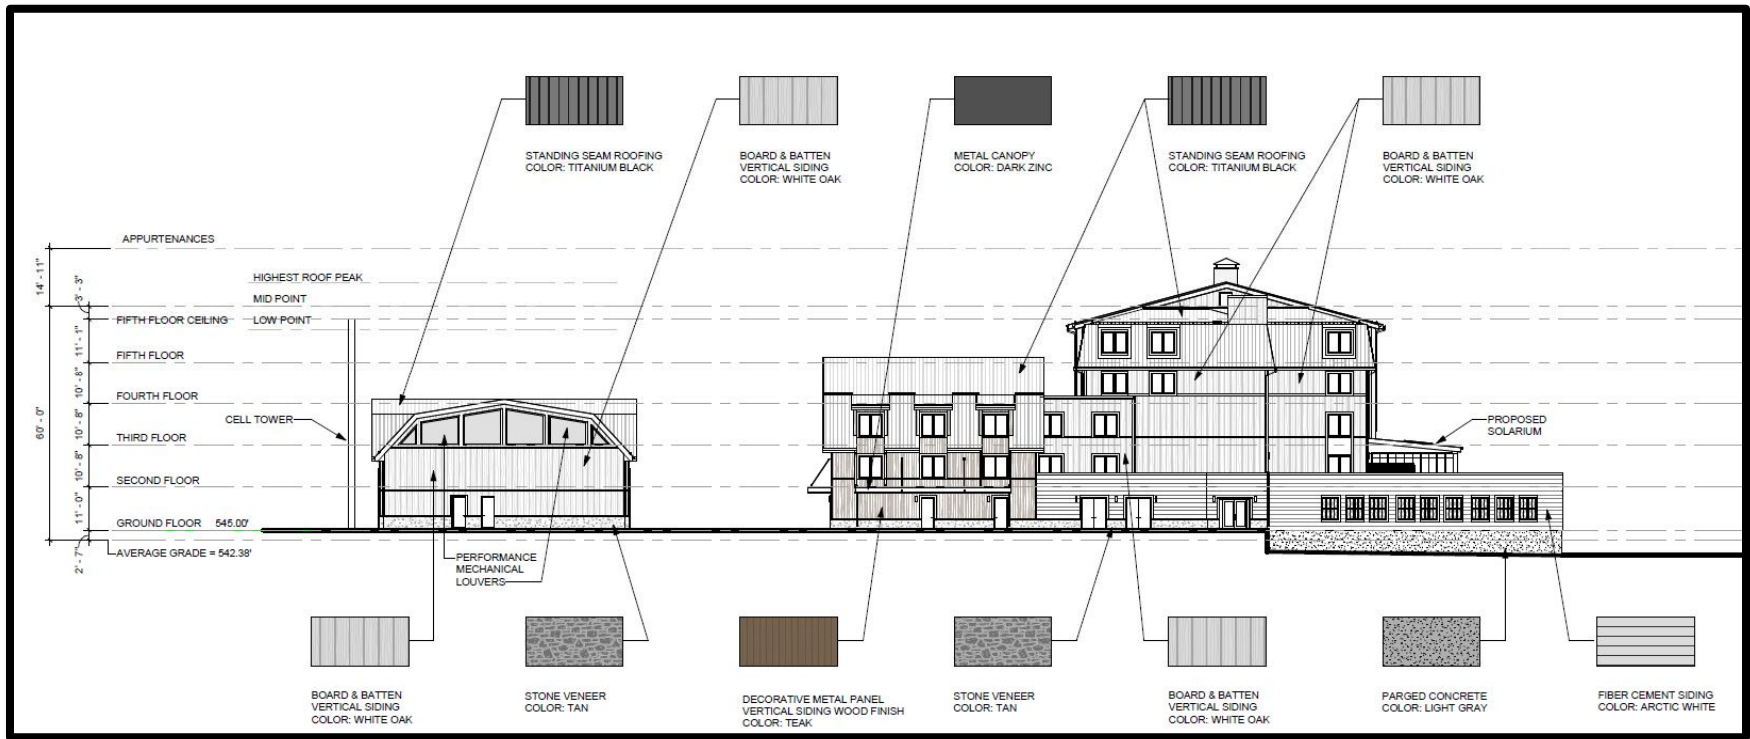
Amended East Elevation – Residential & Accessory Standalone Building
